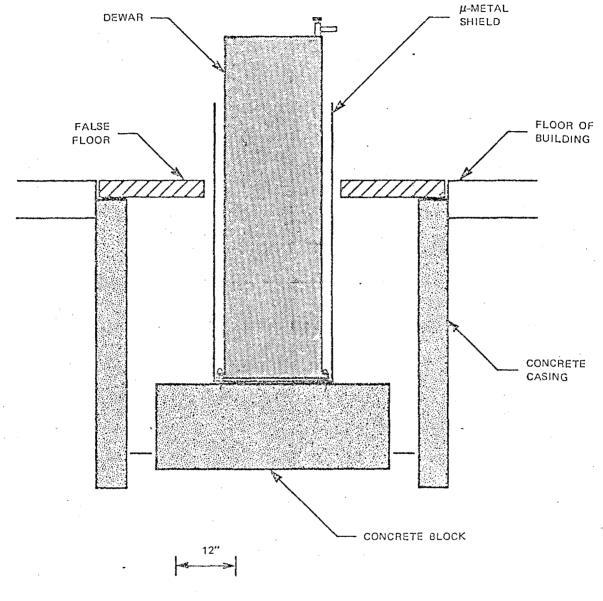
MAGNETOMETER HOUSING CONSTRUCTION
